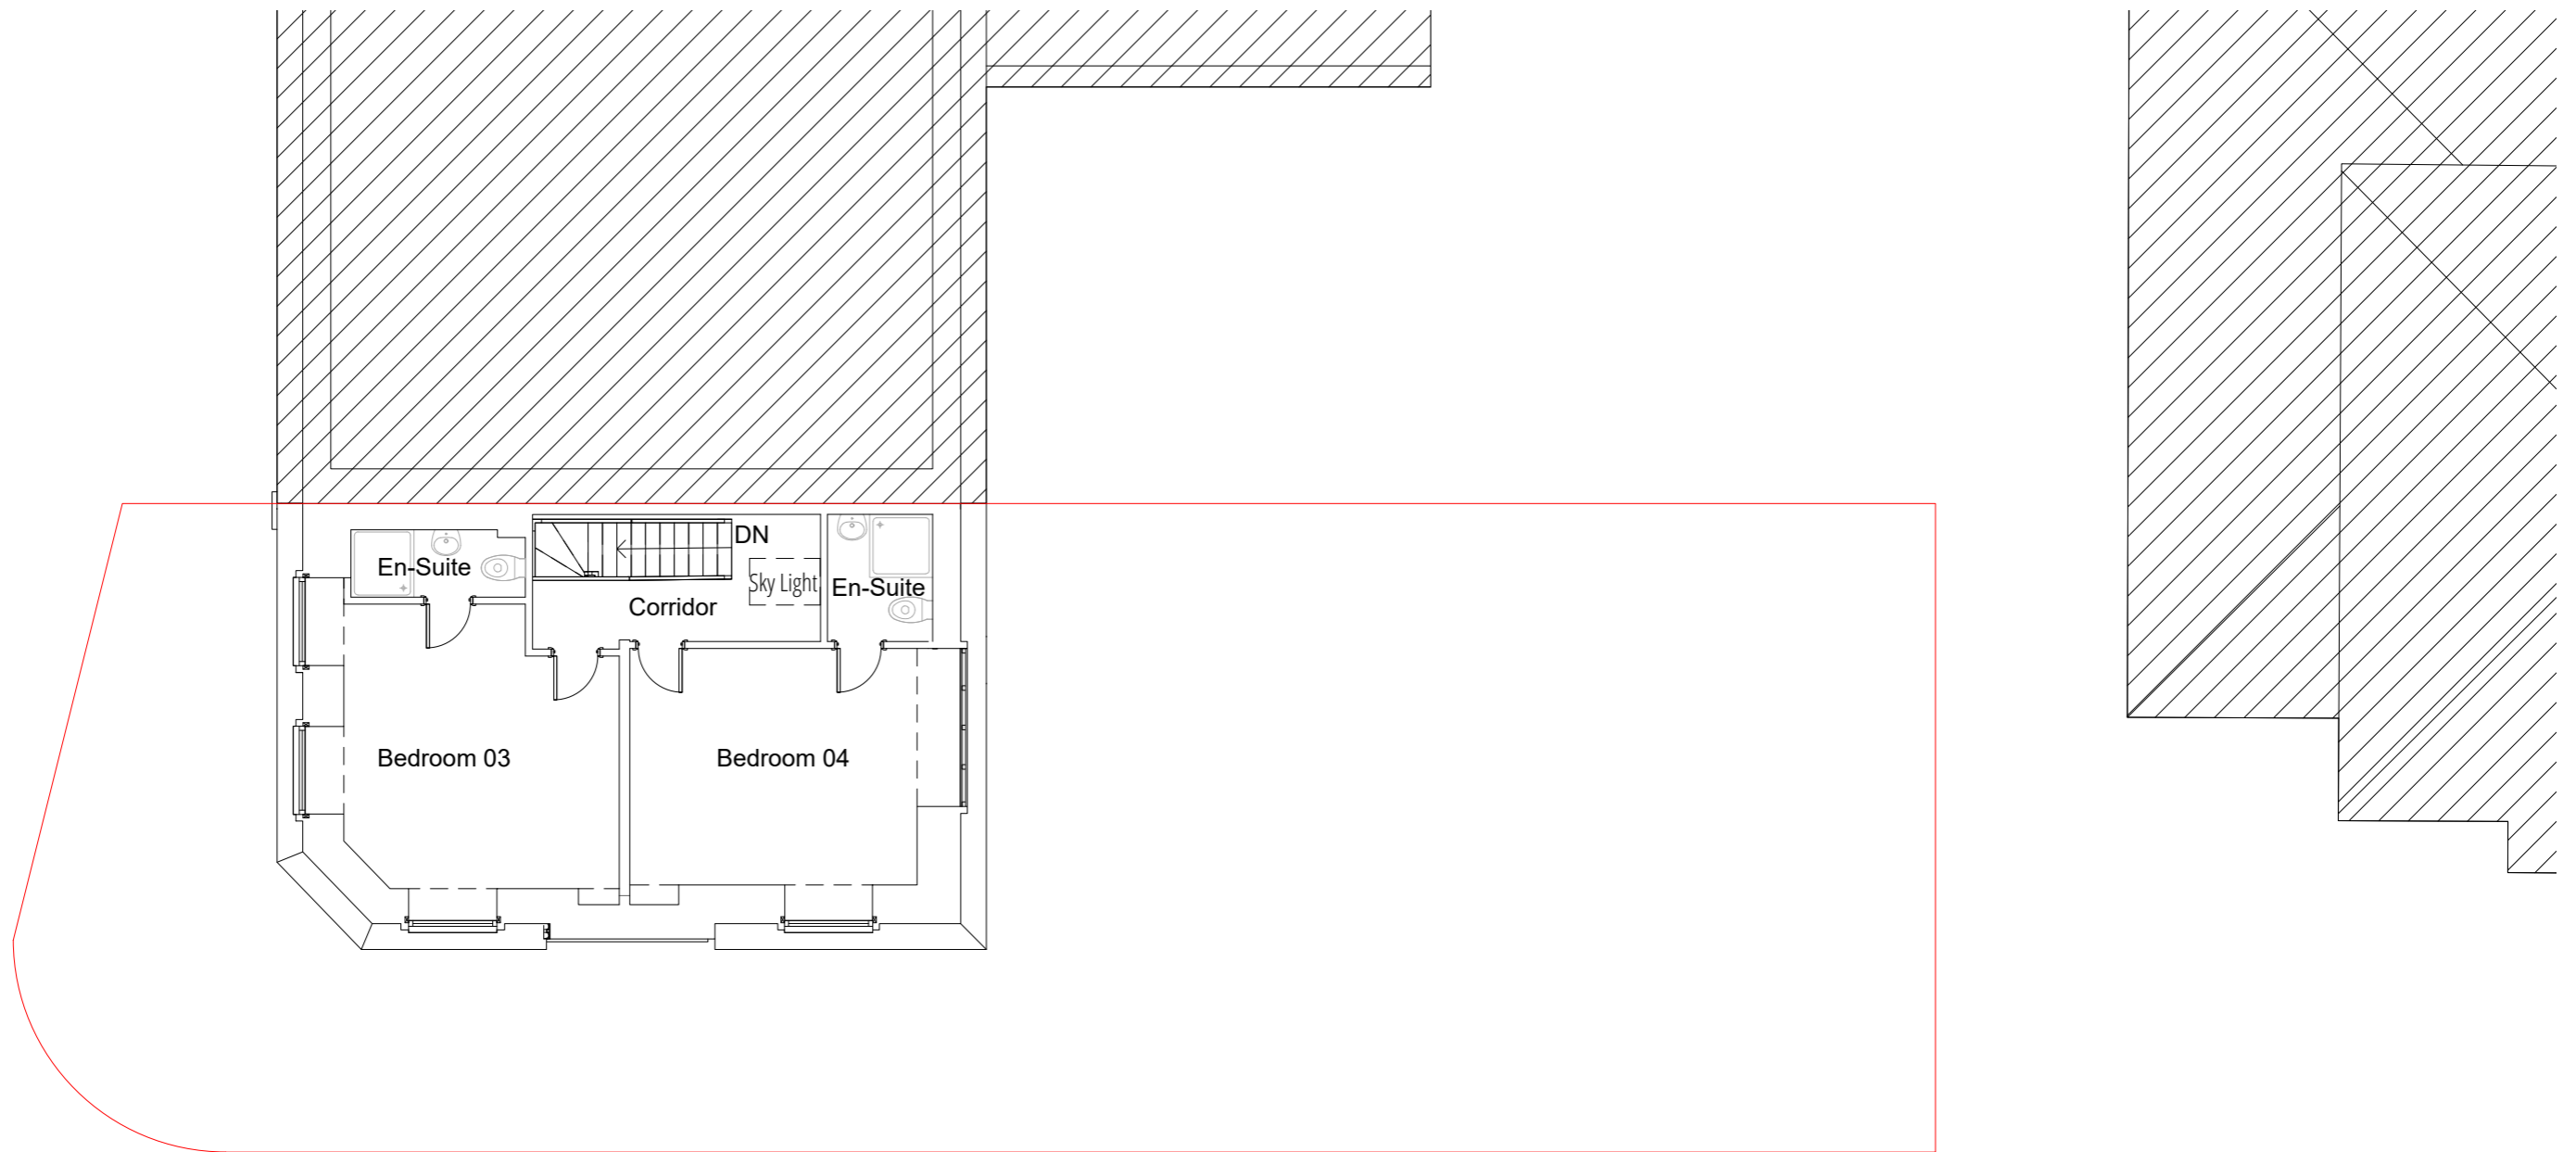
Proposed Second Floor Plan 1:100 @ A3
